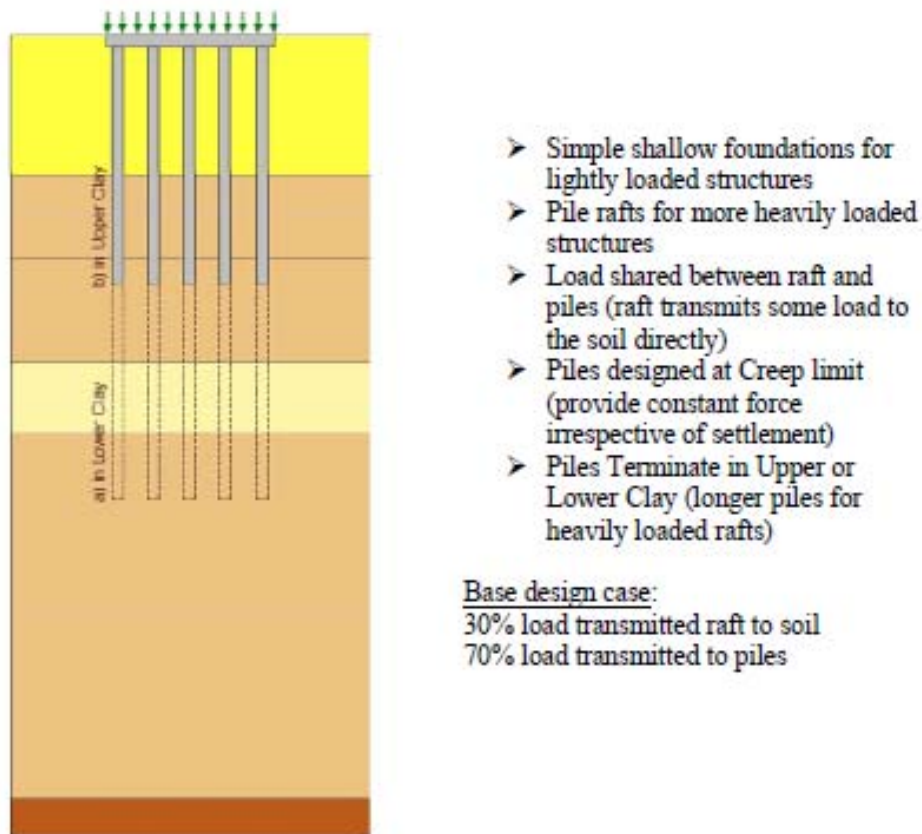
Range of Foundations: Shallow Foundations up to Piled Rafts into Lower Clay (CASE 1).
